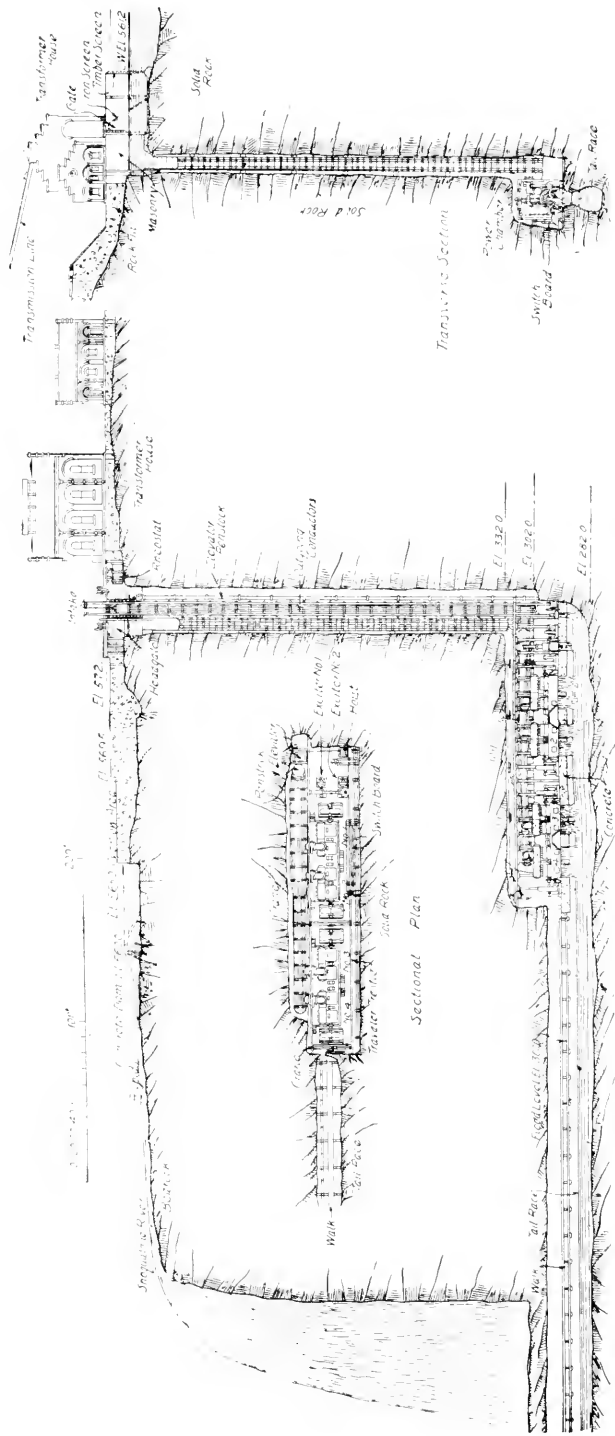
Sectional Elevations of the Plant of the Shoshone Falls Power Company, Washington.
